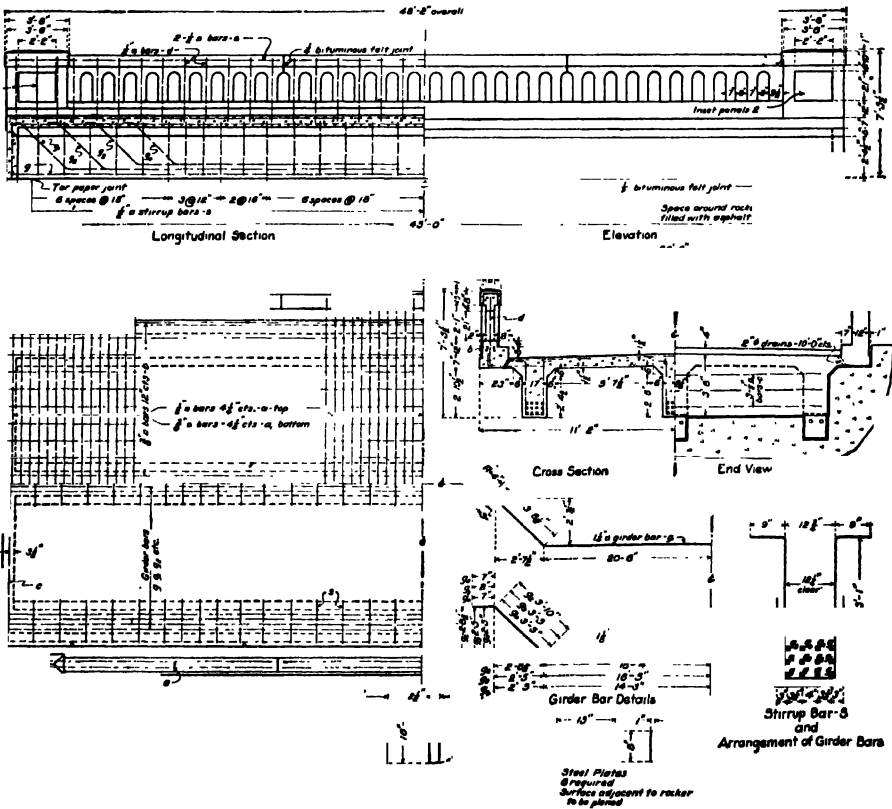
Typical design of deck girder superstructure—span 45 ft.—roadway 20 ft.
